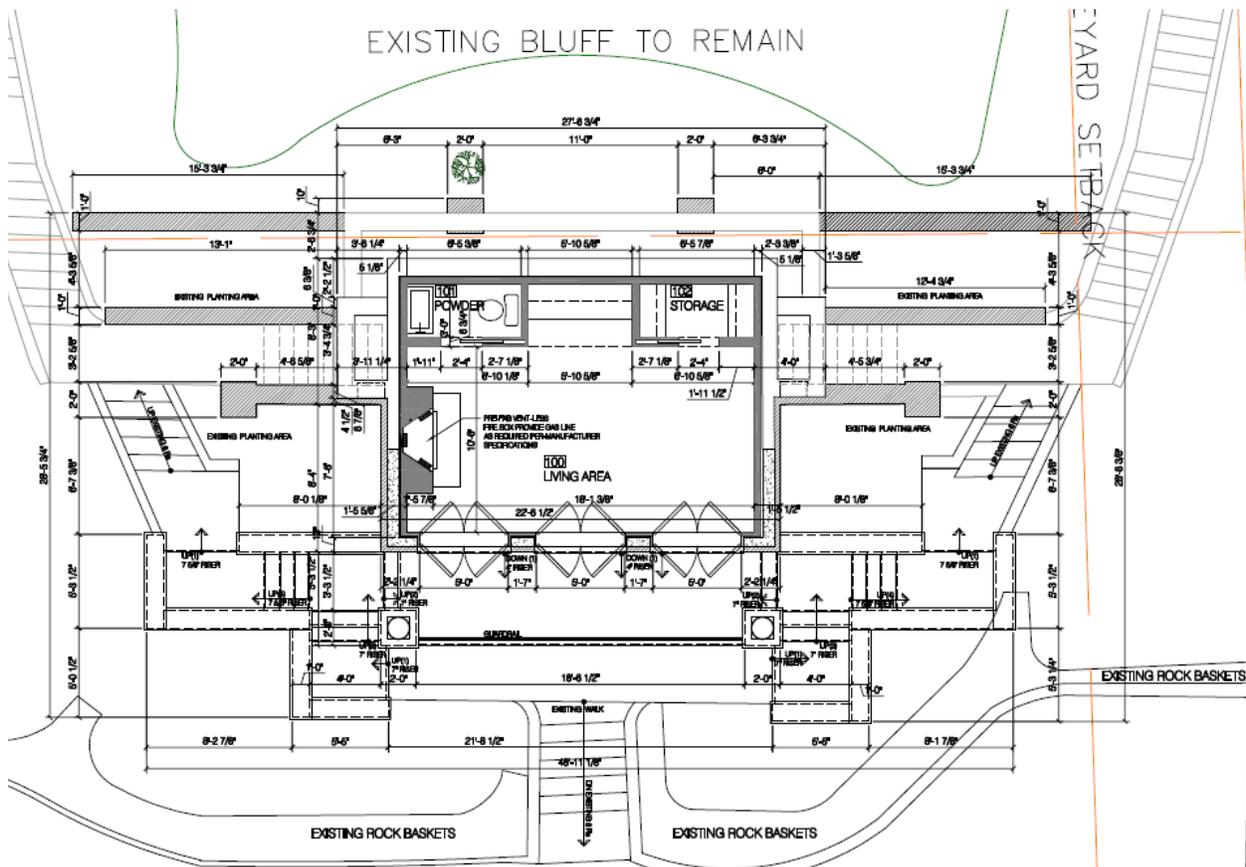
Excerpt of Proposed Floor Plan (Lower Level)
